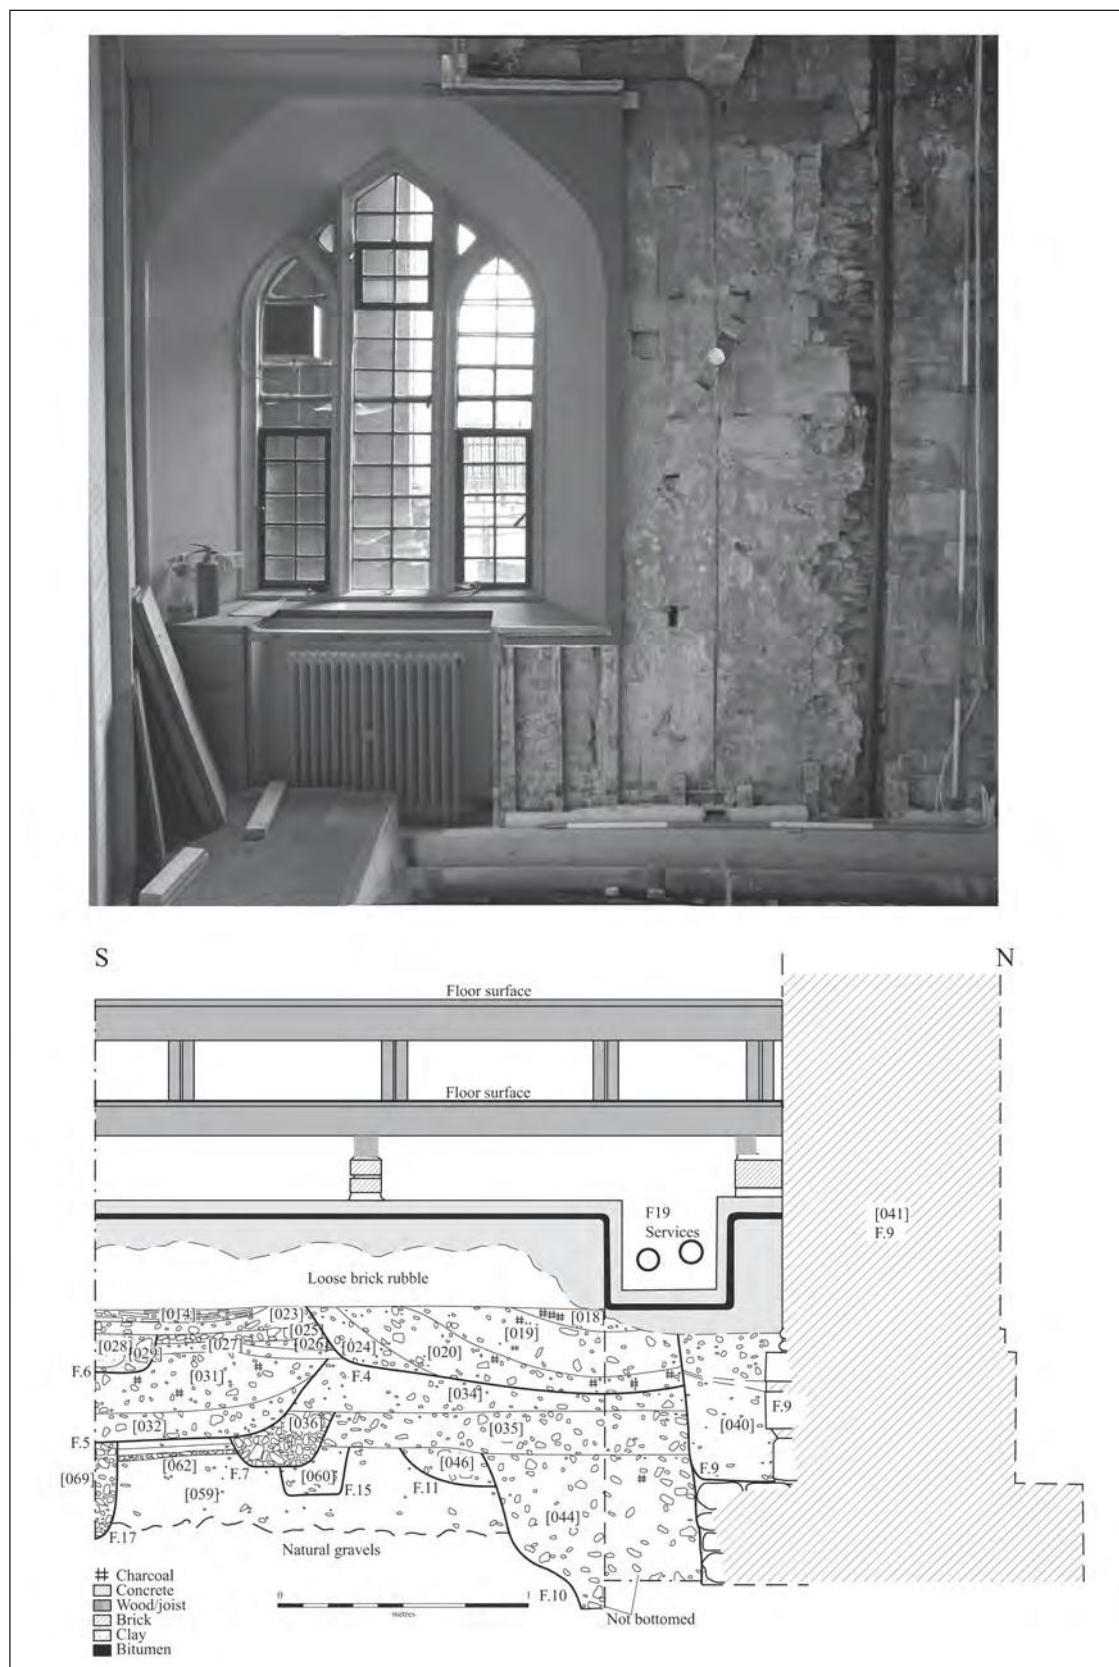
Top, photograph showing the north wall (F.9; note, rebuild-line marking the insertion of the eighteenth century façade wall, left; photograph D Webb) and, below, main east-facing section (see Fig. 2 for location).
